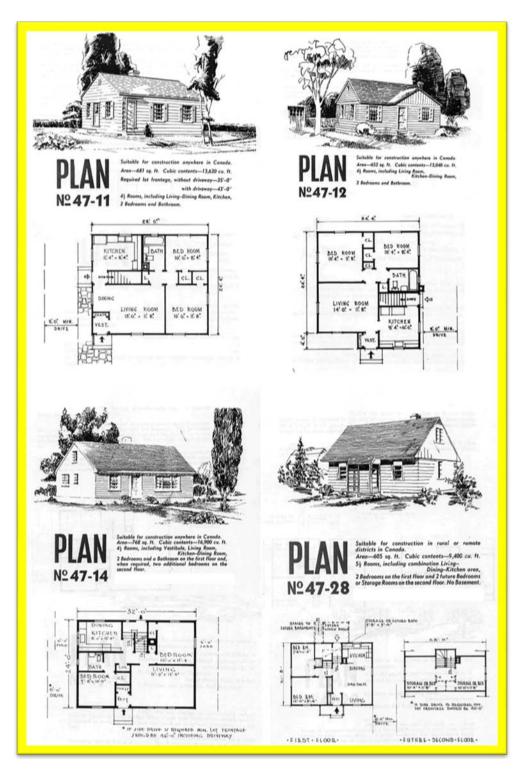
Renderings and floor plans for some standard post-war dwellings published by CMHC in 1947: "67 Homes for Canadians", some with basements and some without (e.g. Plan 47-28 specifies no basement). These houses are similar in size and design to the wartime dwellings shown above.
